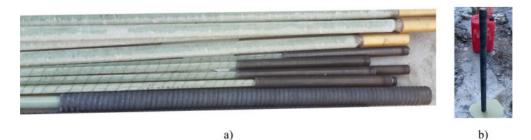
a) Threaded steel tube glued on the GFRP bars with epoxy resin; b) *Silicajet EXP/4* grouted *Glasspree* GFRP bar with threaded steel tube glued externally in CB limestone.
